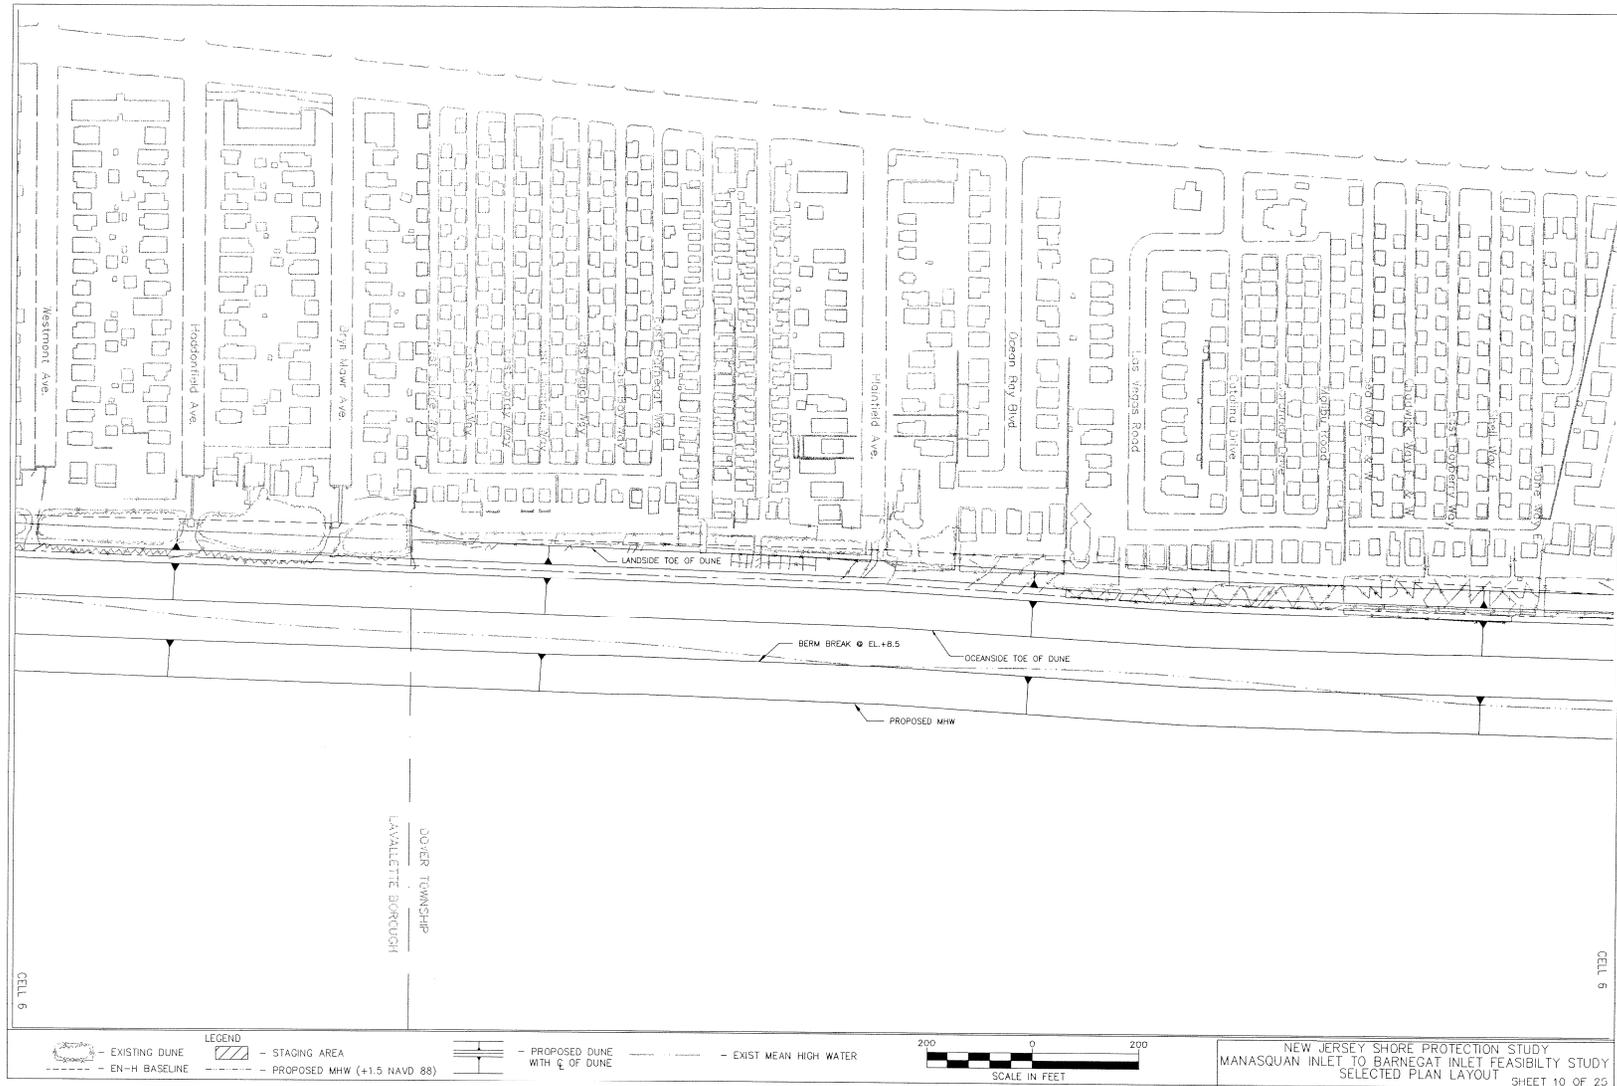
Selected Plan Layout – Lavallette Borough, Westmont Avenue to Dover Township, Ocean Beach
